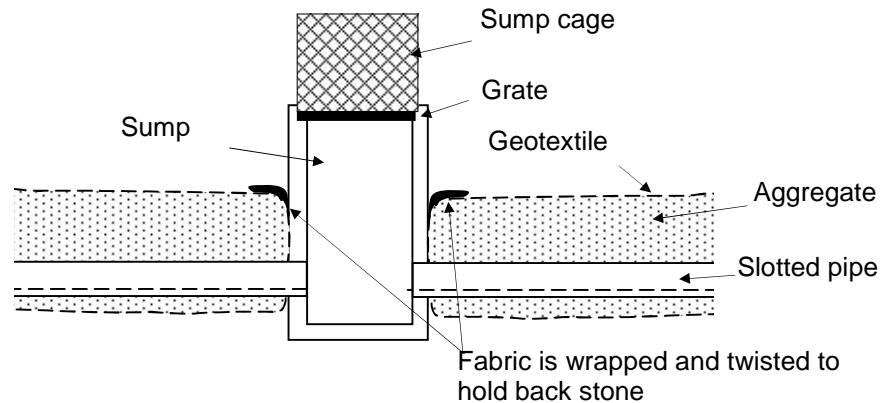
Method of joining longitudinal subsoil drain to sumps
